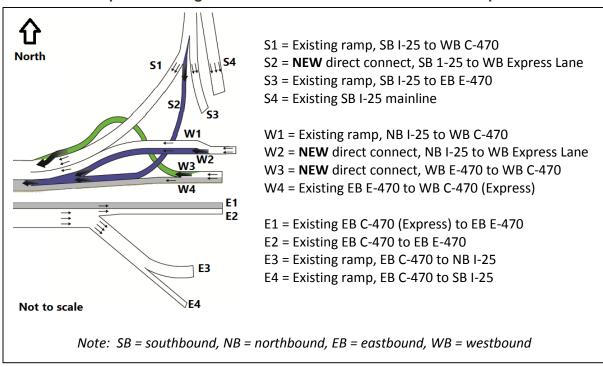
Proposed Configuration of C-470/I-25 Direct Connect Ramps
